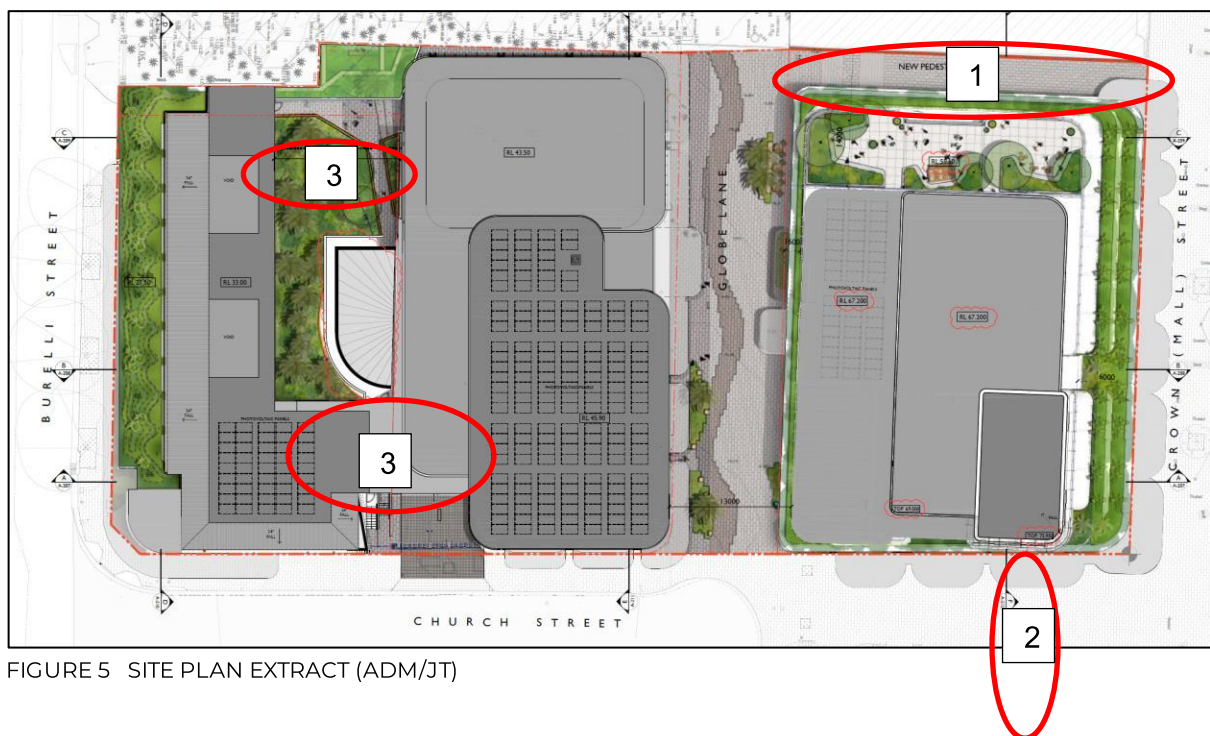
SITE PLAN EXTRACT (ADM/JT)
